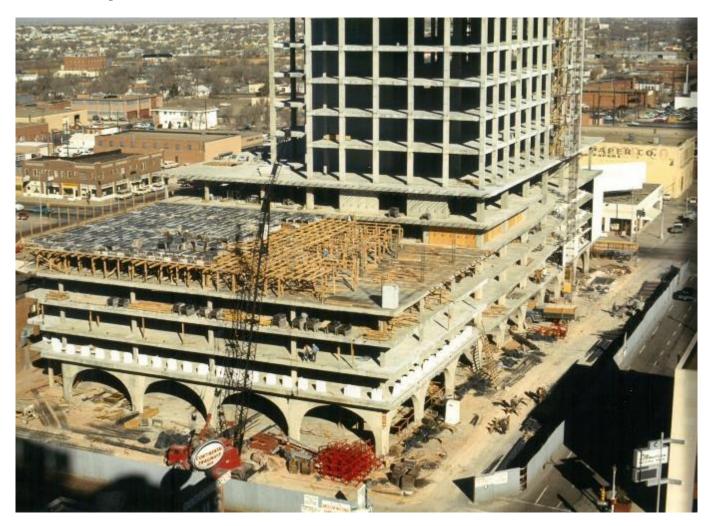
American National Bank Building and SPS Tower Aerial, facing west c. 1970
